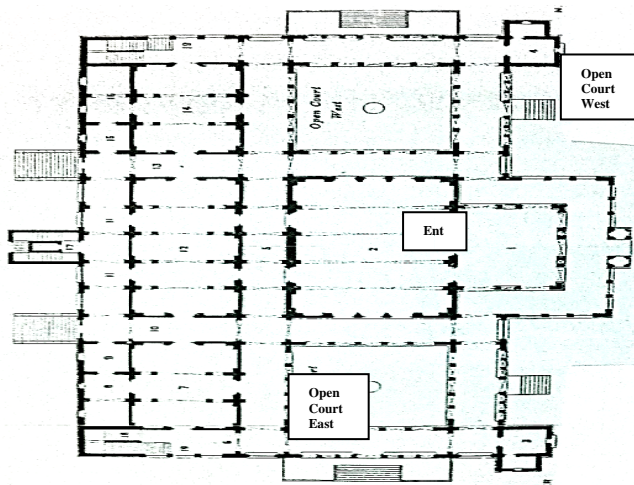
Ground Floor Plan of Albert Hall Museum India
